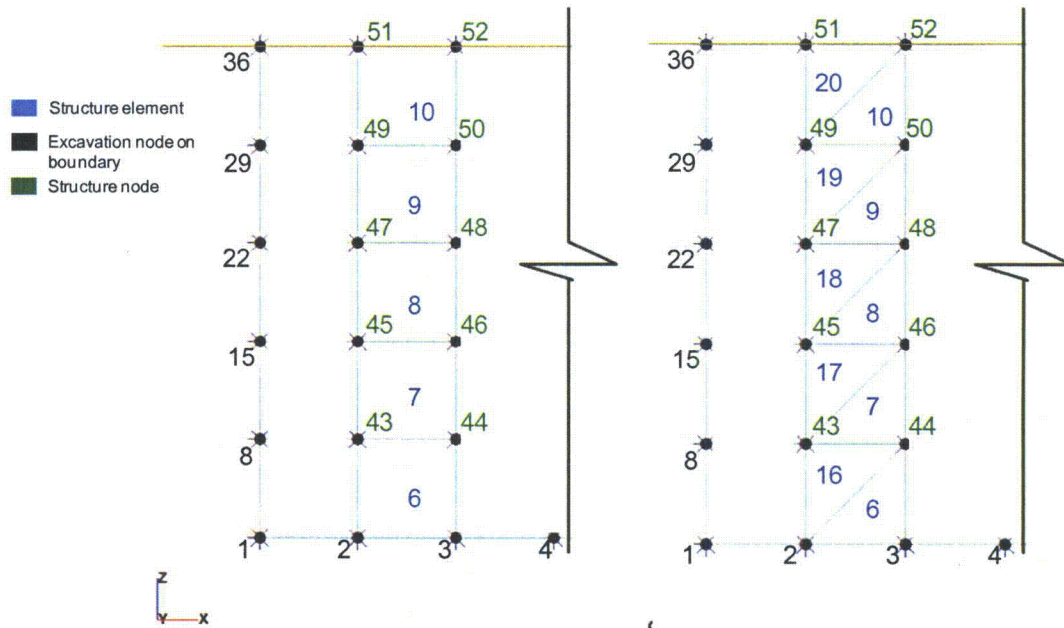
SASSI Model - Rectangular Element Structure shown on Left and Triangular Element Structure Shown on Right (Right Edge of Excavation Not Shown)
